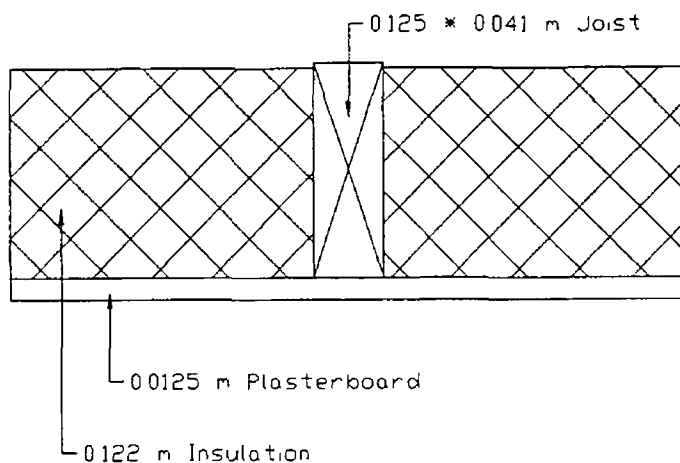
13 1 Semi-Detached House Uninsulated Joists
